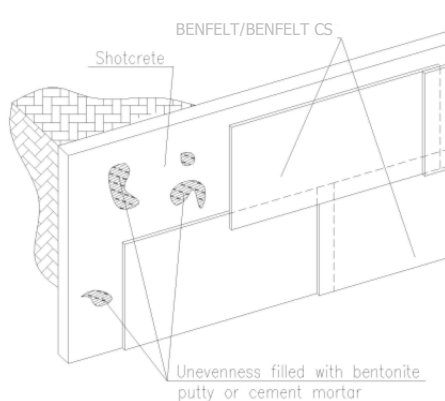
Installation of BENFELT on shotcrete layer placed on horizontal walls of the foundation excavation.
